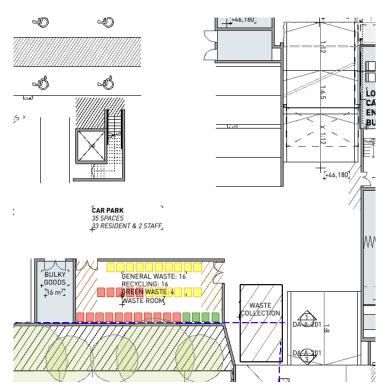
PLAN OF BASEMENT WASTE STORAGE AREA & BULKY GOODS
